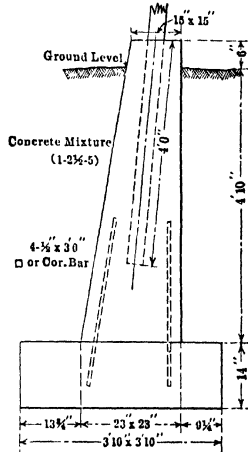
Concrete footing for 75-ft. double-circuit tower.
